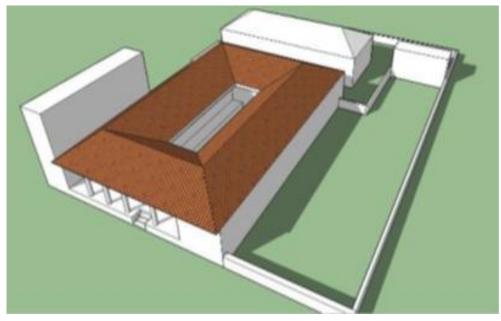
Section of Dwelling Unit (Source: Chadalavada et al., 2017)
